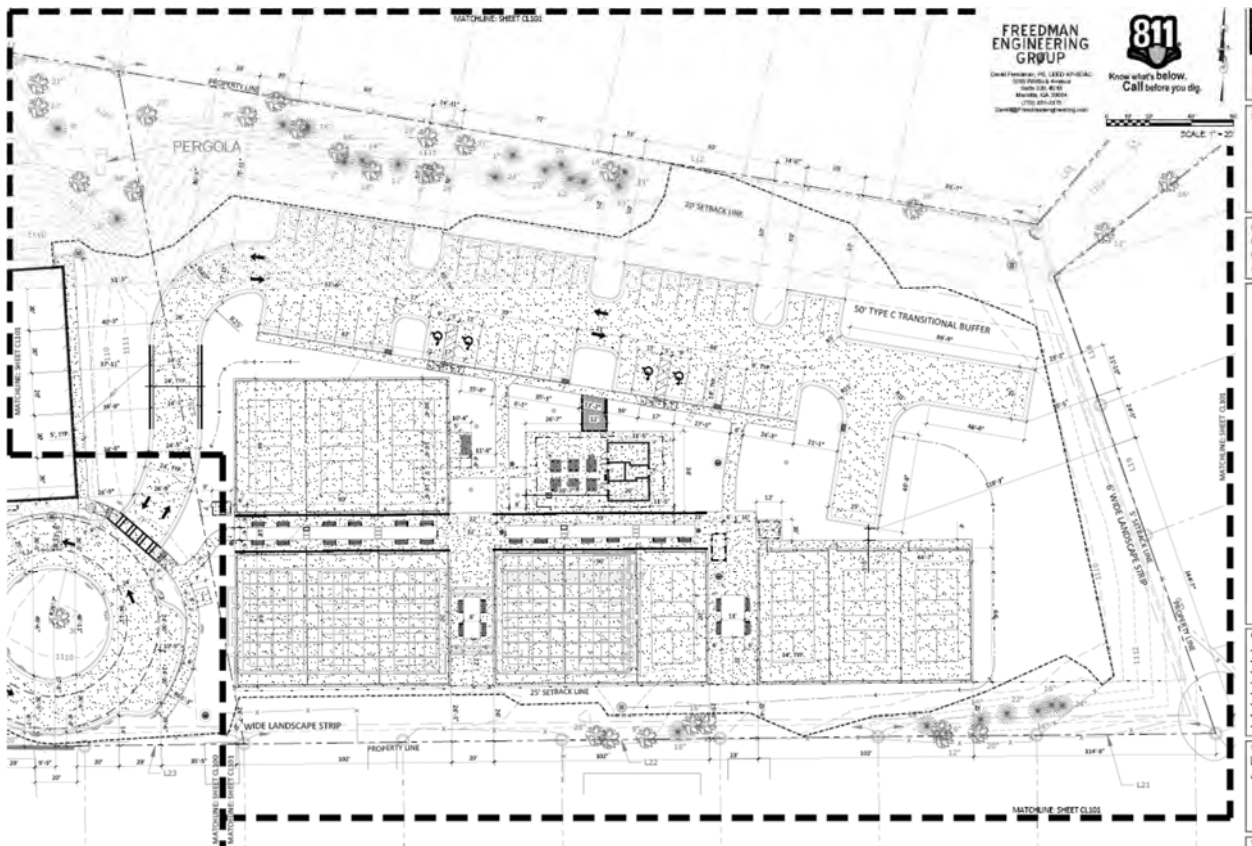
Site plan of proposed pickle ball courts, east side of Rec Center building.
